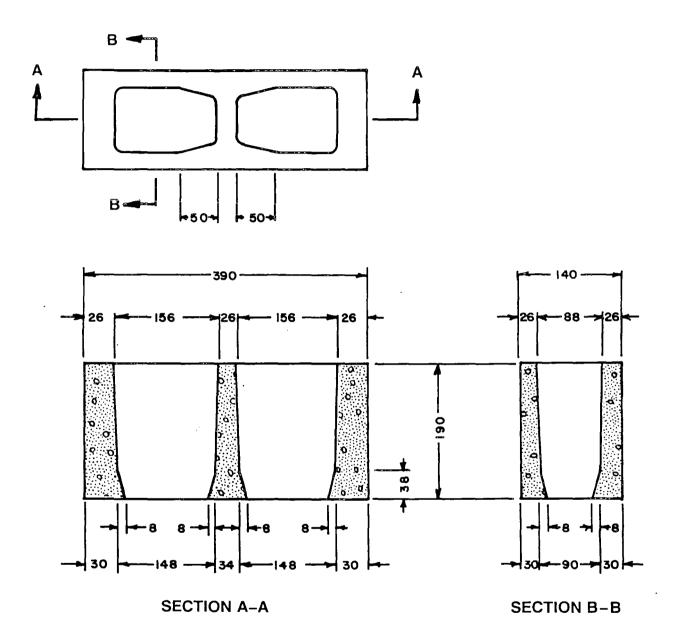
Dimensions of 150 Standard Concrete Block Units
